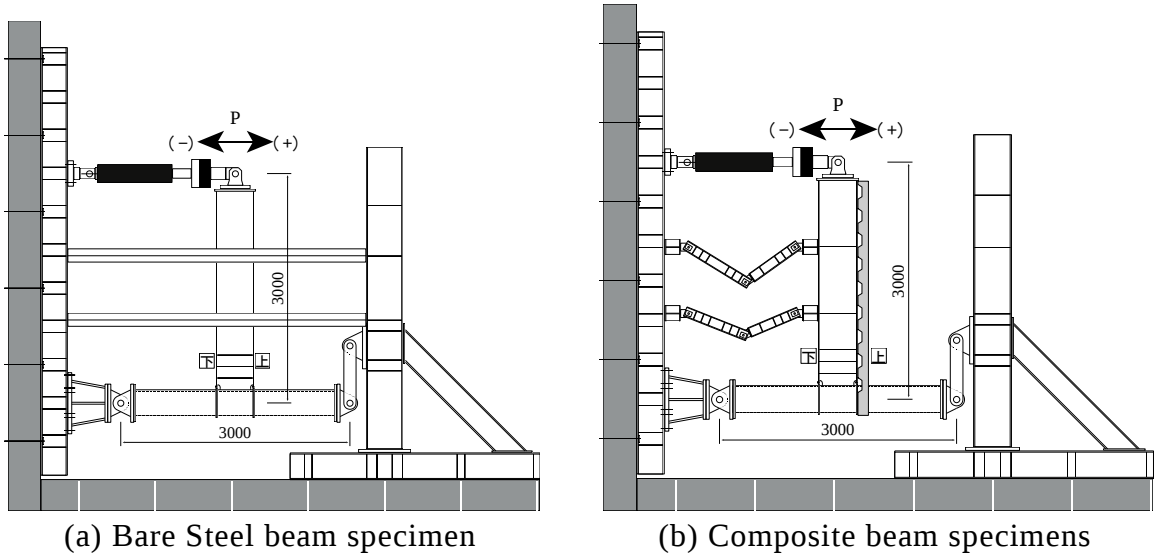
Bare steel beam and composite beam specimen test setup
